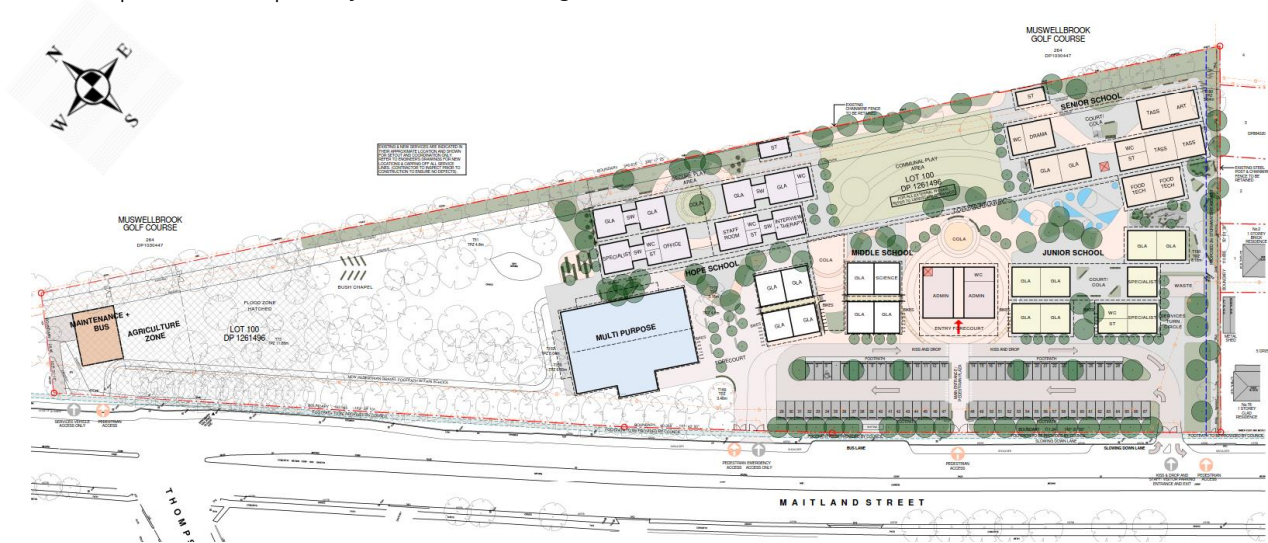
Masterplan – Site Layout (Source: NBR Architects)
